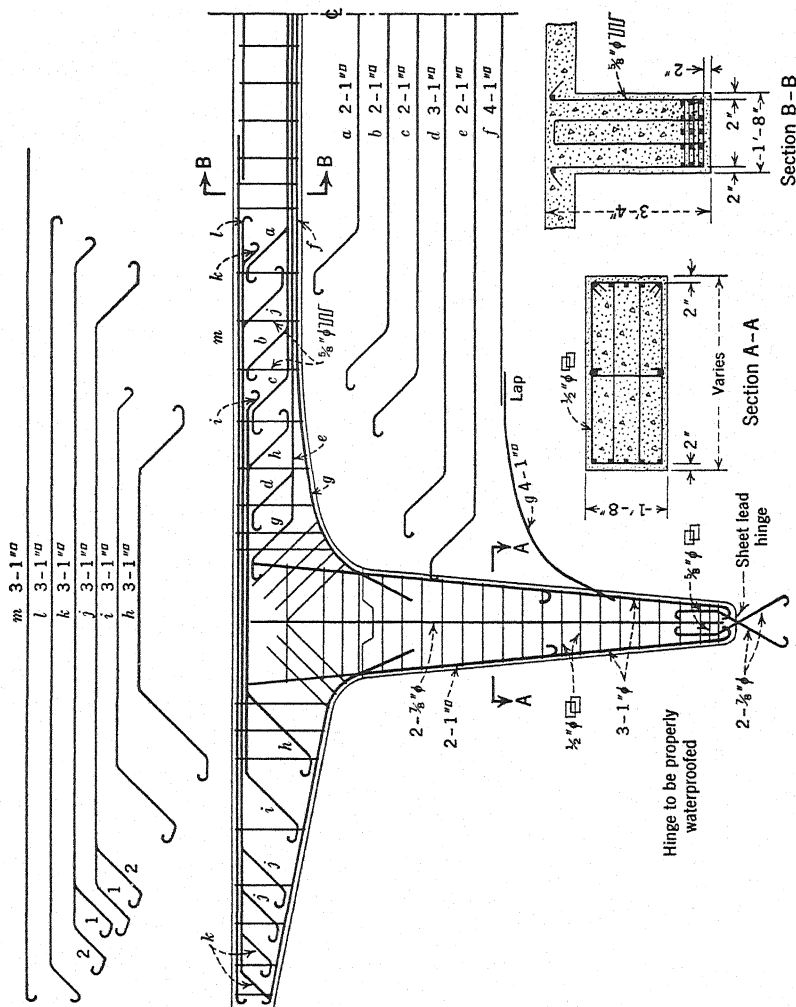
Example. Details of Rigid Frame with Cantilevers. (See p. 302.)
